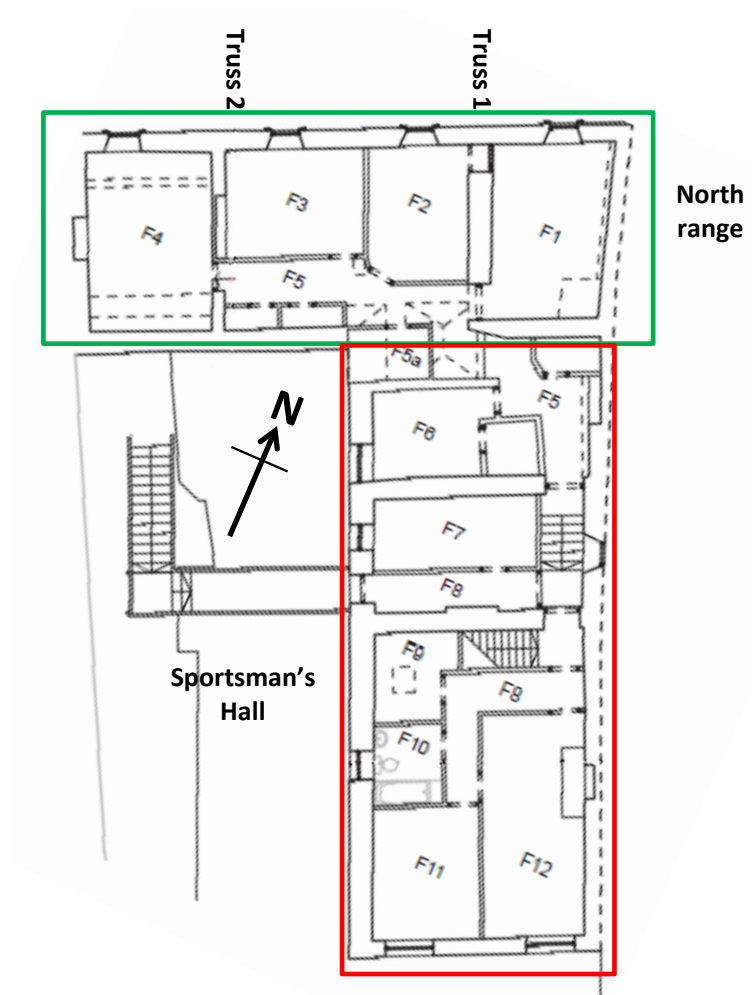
Plan at first floor level to show layout and arrangement of the Cavendish Arms, and the positions of the trusses to the north range (after Dan Elsworth, Greenlane Archaeology Ltd)
